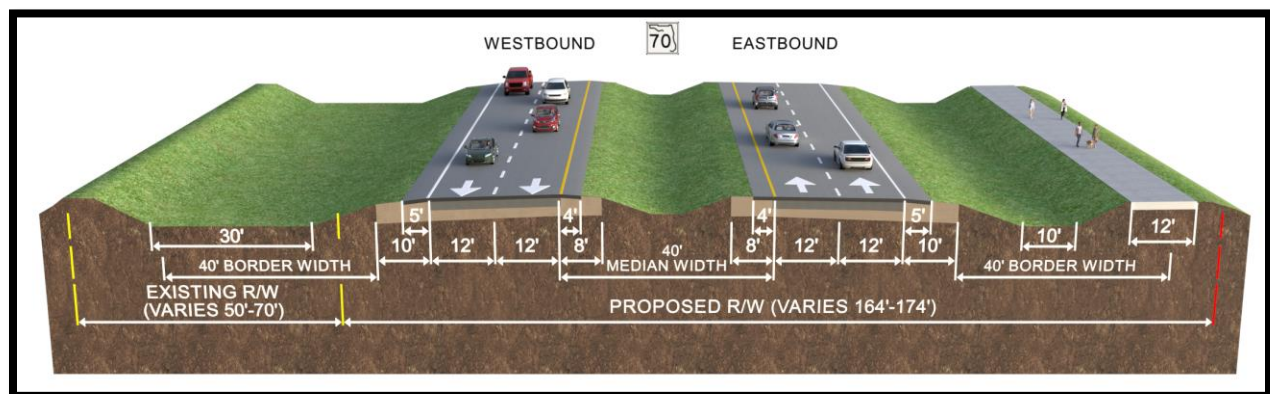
| SR 70 – Proposed Roadway Typical Section One
